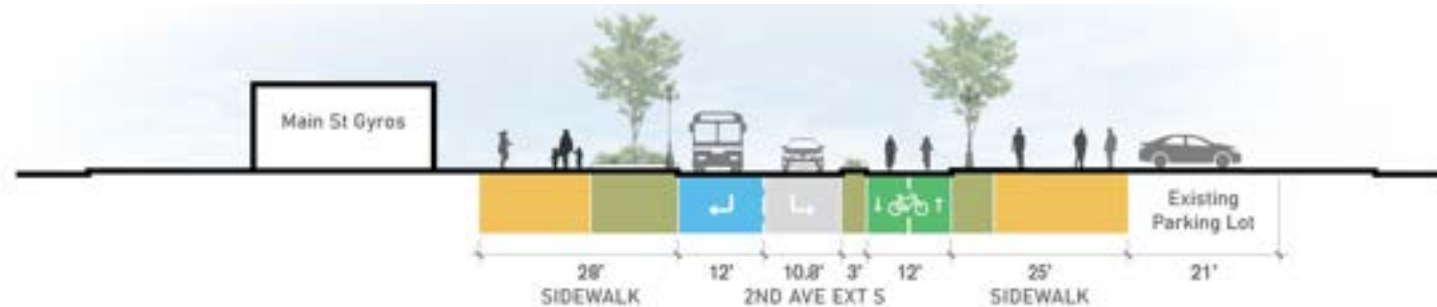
Stitch Focus Area: Section AA'. Illustrative street section at 2nd Ave Ext S showing proposed multimodal improvements including separated bike facilities, expanded sidewalks, street trees, and stormwater features.
